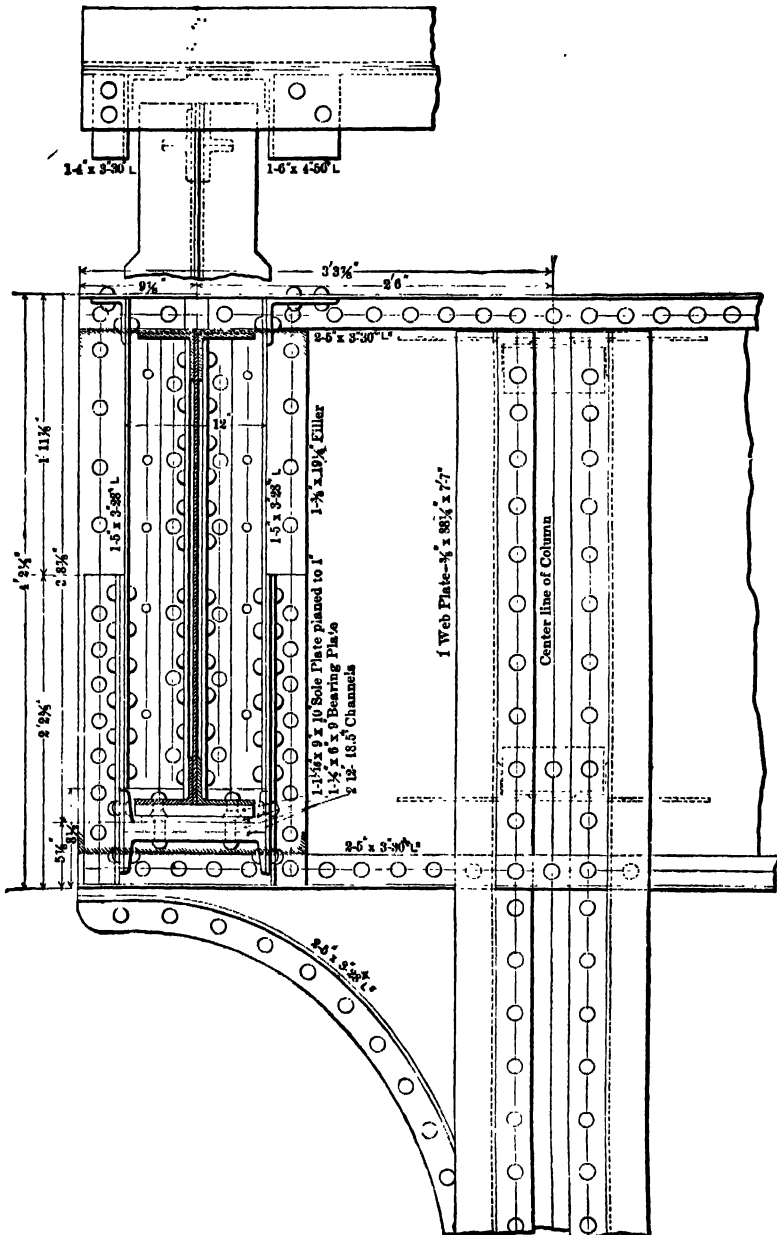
Details of Expansion Pocket for Elevated Railroads.
